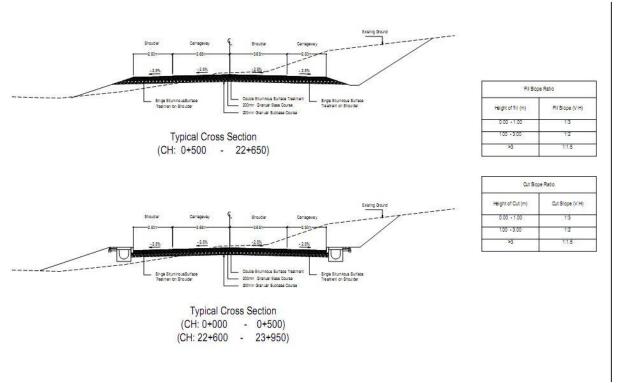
Typical Cross Section of Asutuare – Aveyime Road (Section 2 Project Road)
